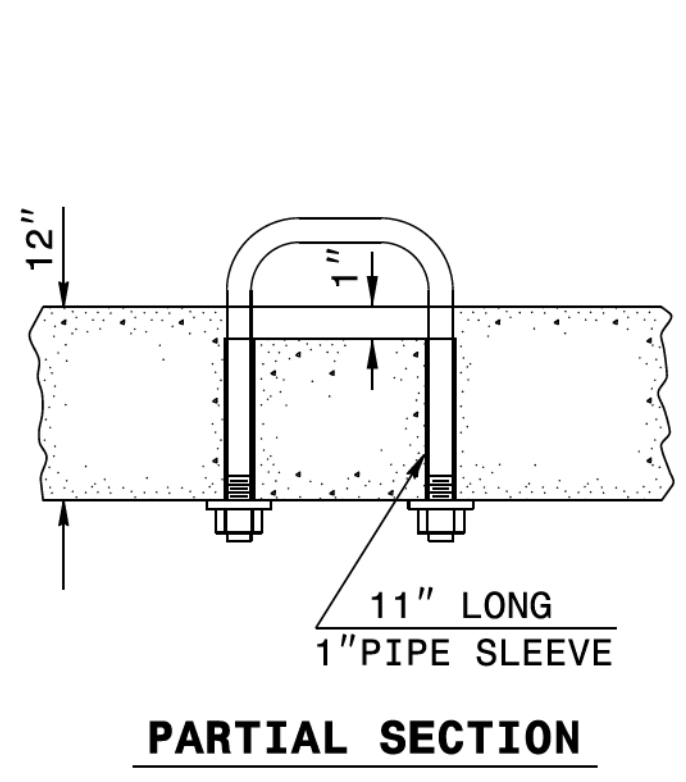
DETAIL OF PIPE HANDRAIL MOUNTED ON A WALL
